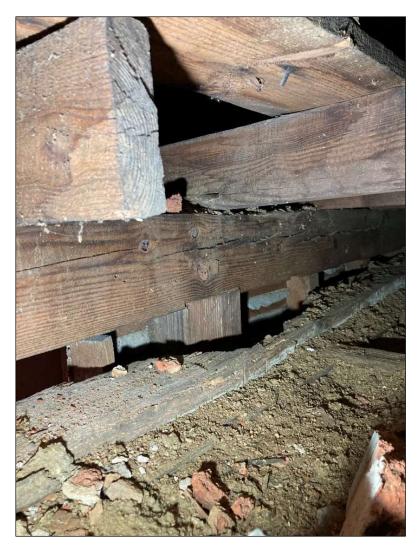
Attic, above log section looking at frame construction of the front frame section of the house. The horizontal beam in the center of the photo is the top plate of the frame section of the house, with vertical members mortised and pegged into it below. Just below that plate in the photo is the top log in the log wall that abuts the frame section of the house. Notice that this log has the remains of whitewash on one side, suggesting it is probably reused in this location. May 2023. Photo by the author.
